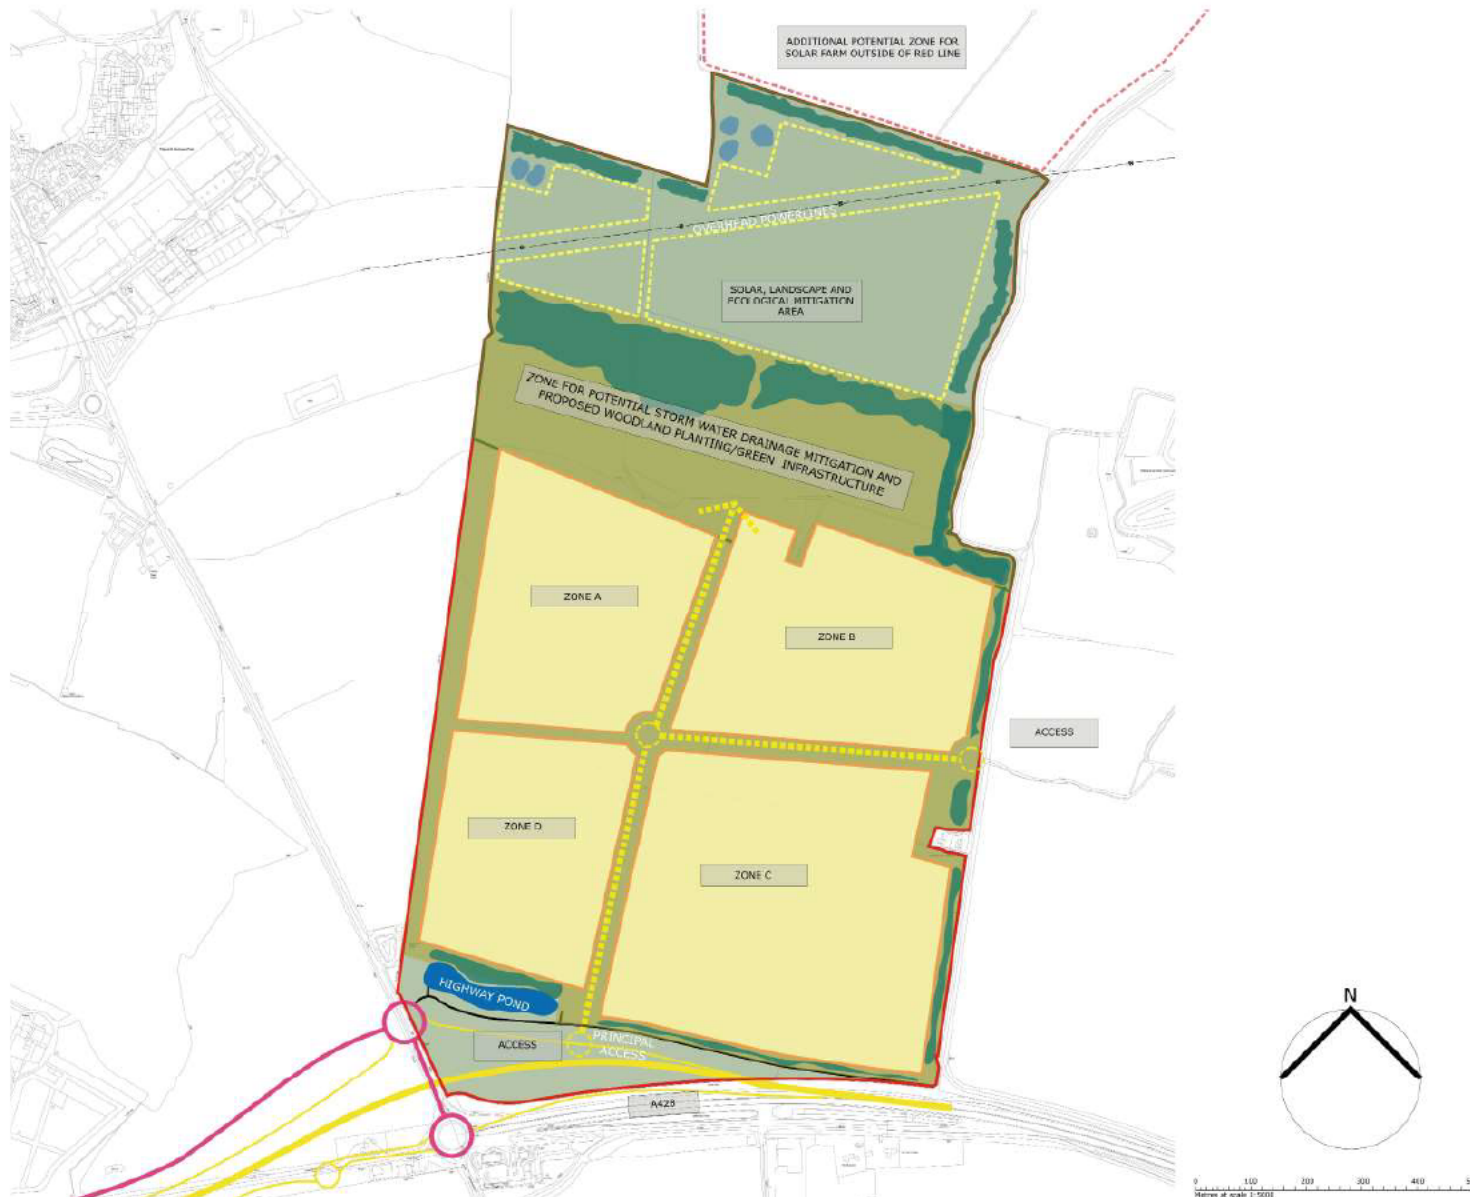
DEVELOPMENT FRAMEWORK PLAN
